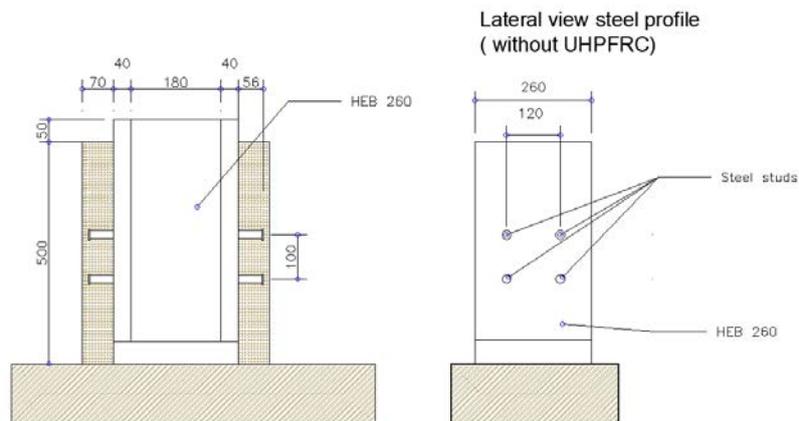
Example of specimen for a shear test, UHPFRC slab welded to a profile with the same dimensions as the bridge girder flange.
